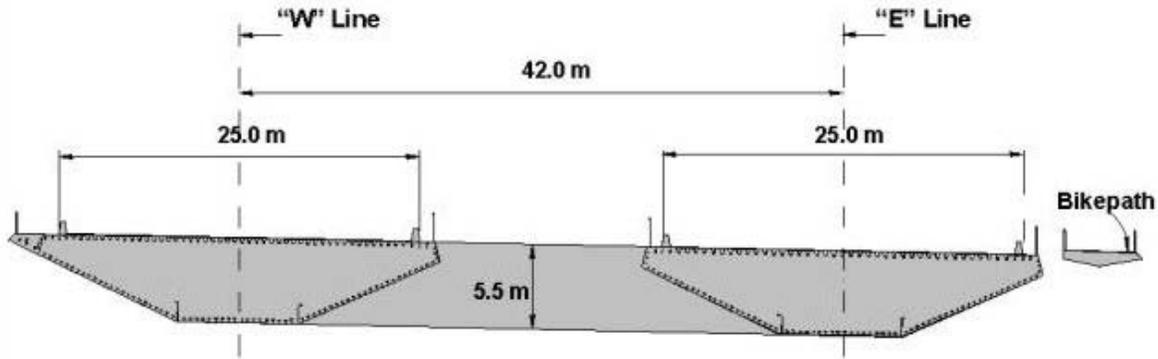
Cross section of the steel box girders at the SFOBB Self-Anchored Suspension Bridge
